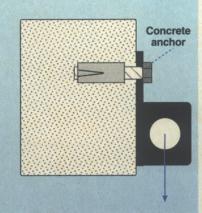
A typical installation of an attachment plate attached to a concrete beam.
